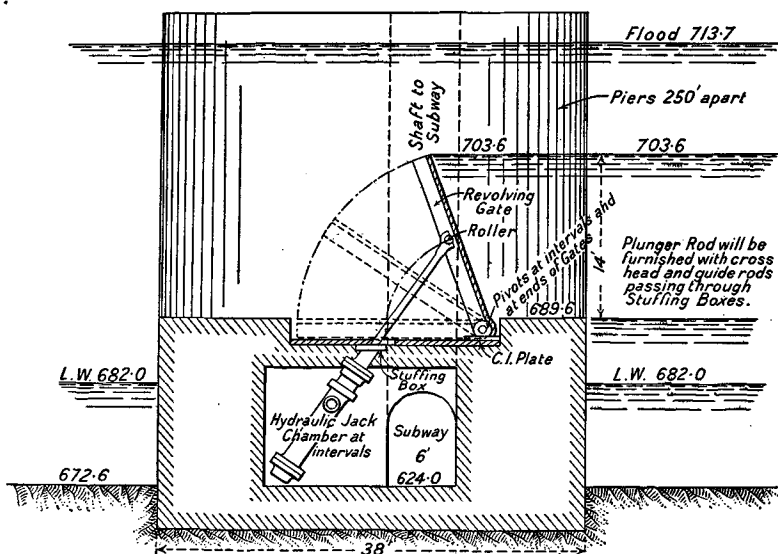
St. Andrew's Rapid Dam. Alternative Design, No. 1.
